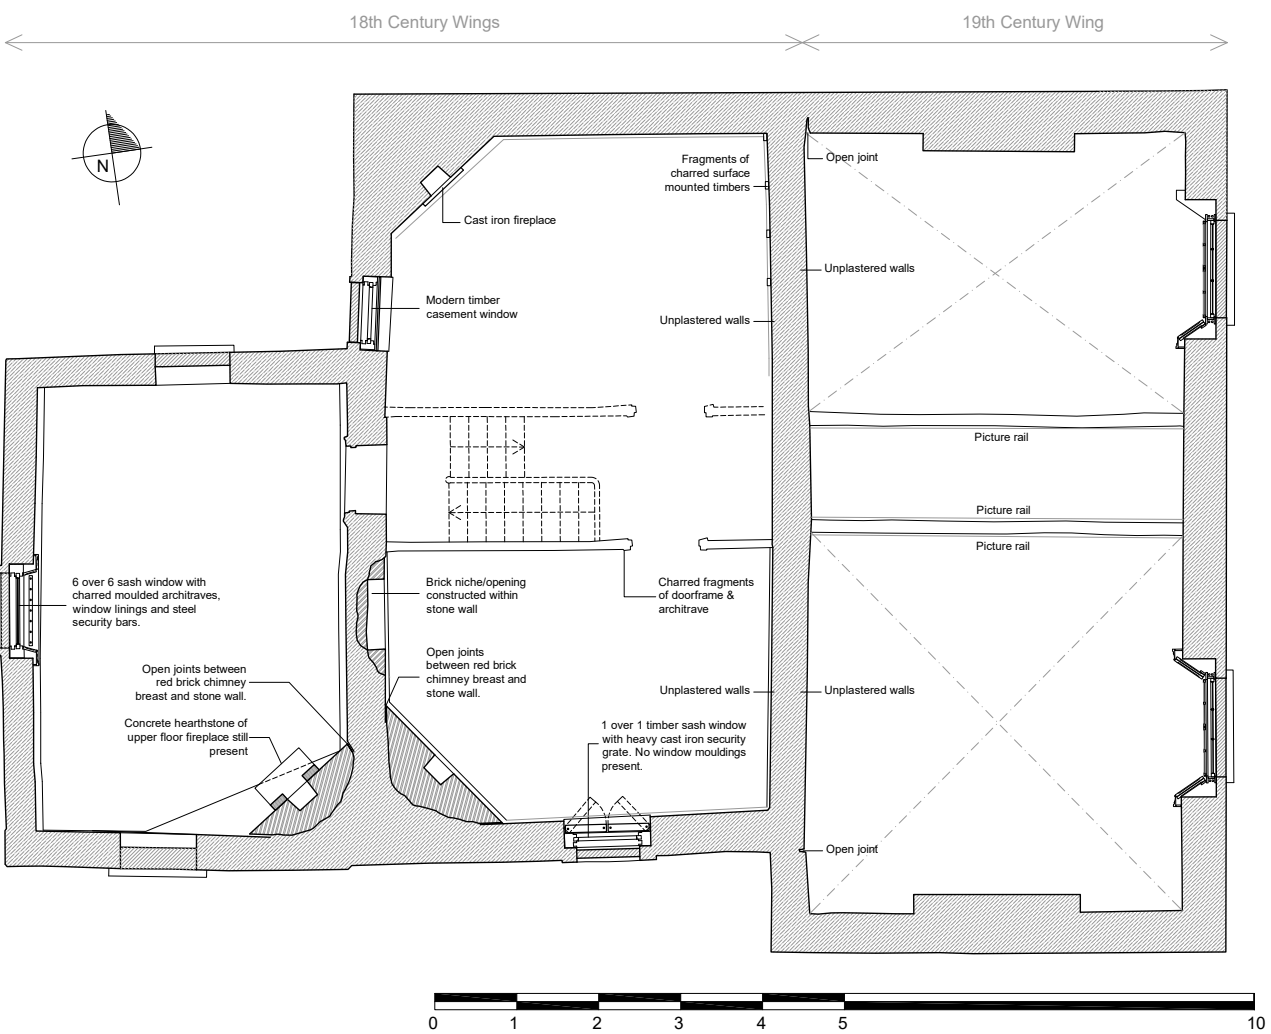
Upper Floor Plan- Blackwood Associates Architects Survey
